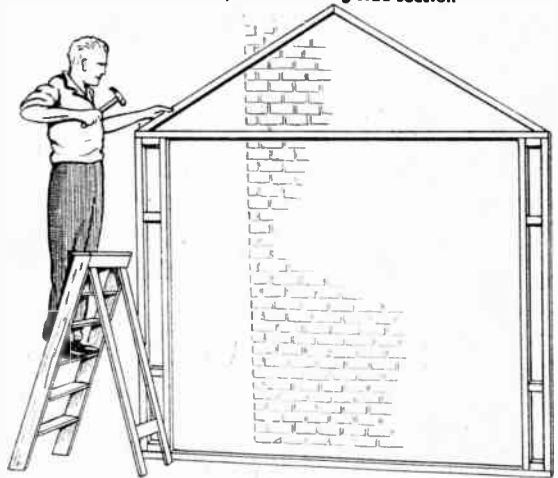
Nailing in 4ft. 10in. angle pieces to front
